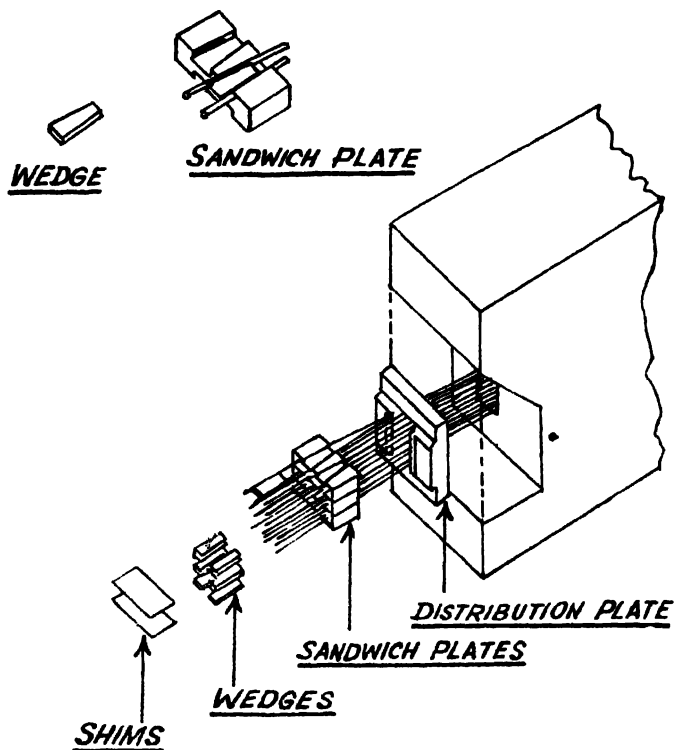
EXPLODED VIEW OF MAGNEL-BLATON ANCHORAGE SYSTEM
